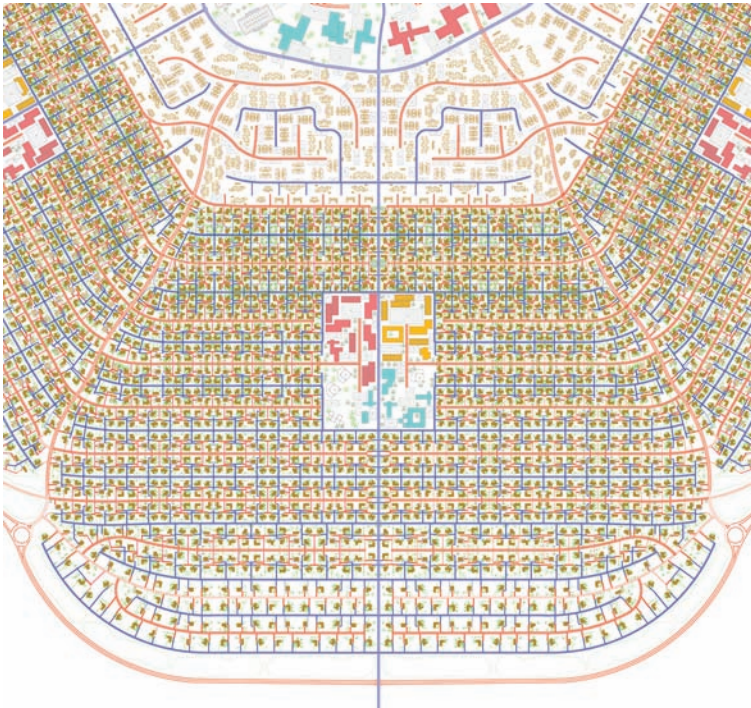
Detailed view of a main LLM/FHV branch with structures and landscape.
